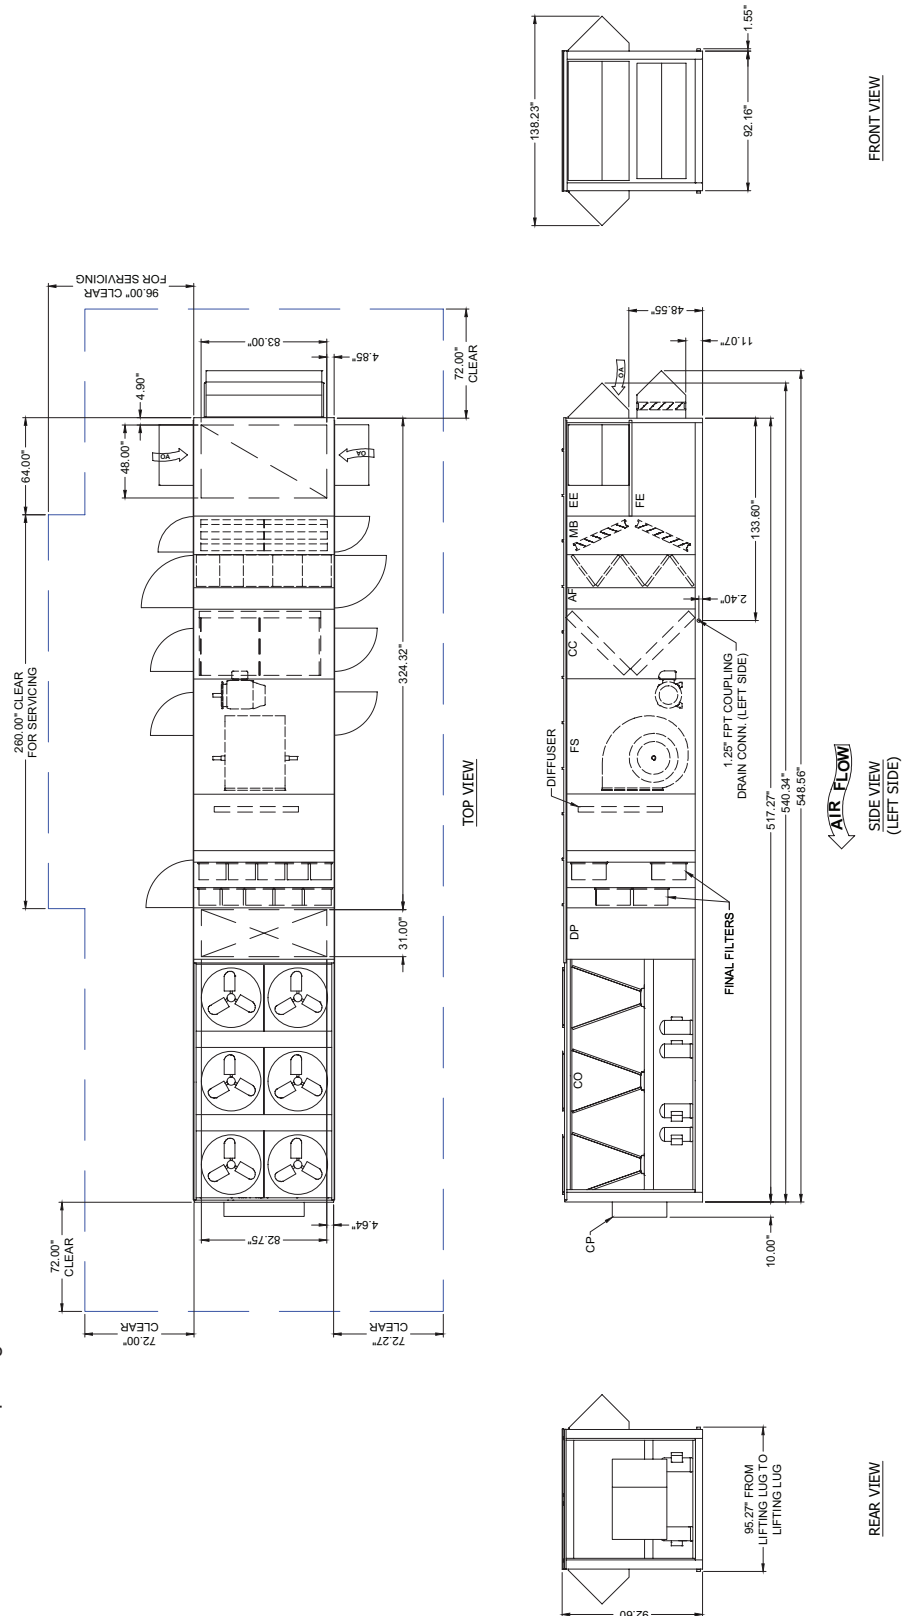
GENERAL ARRANGEMENT DRAWING
